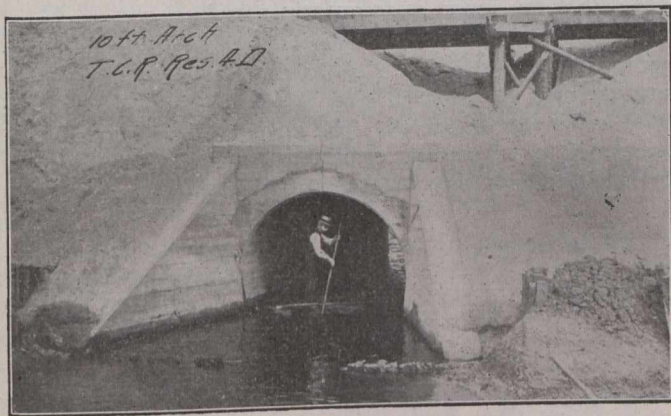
Typical Railroad Culvert With 10-Foot Opening.
